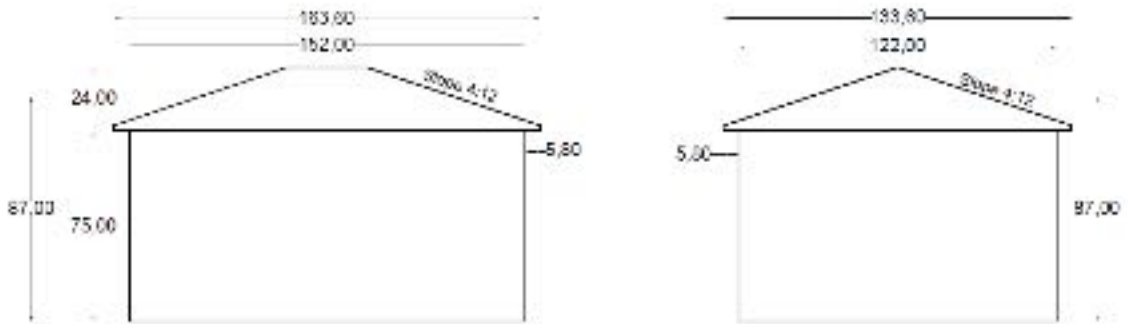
2: Model A layout (a) Elevation View (b) Side View (all dimensions are at model-scale in cm)
